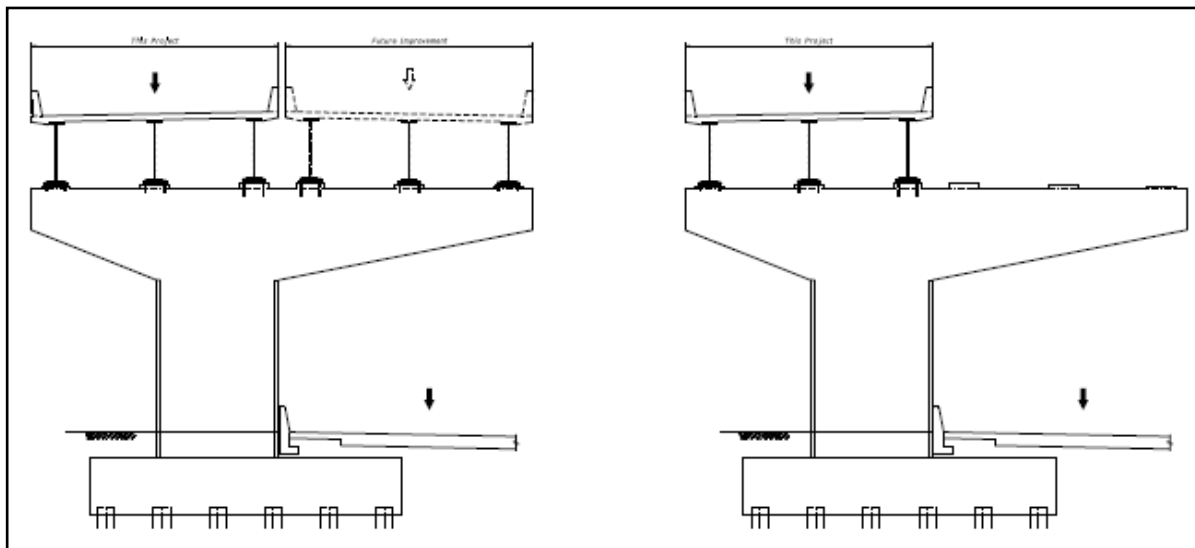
Pier 19 Substructure Overbuild for Future Widening
